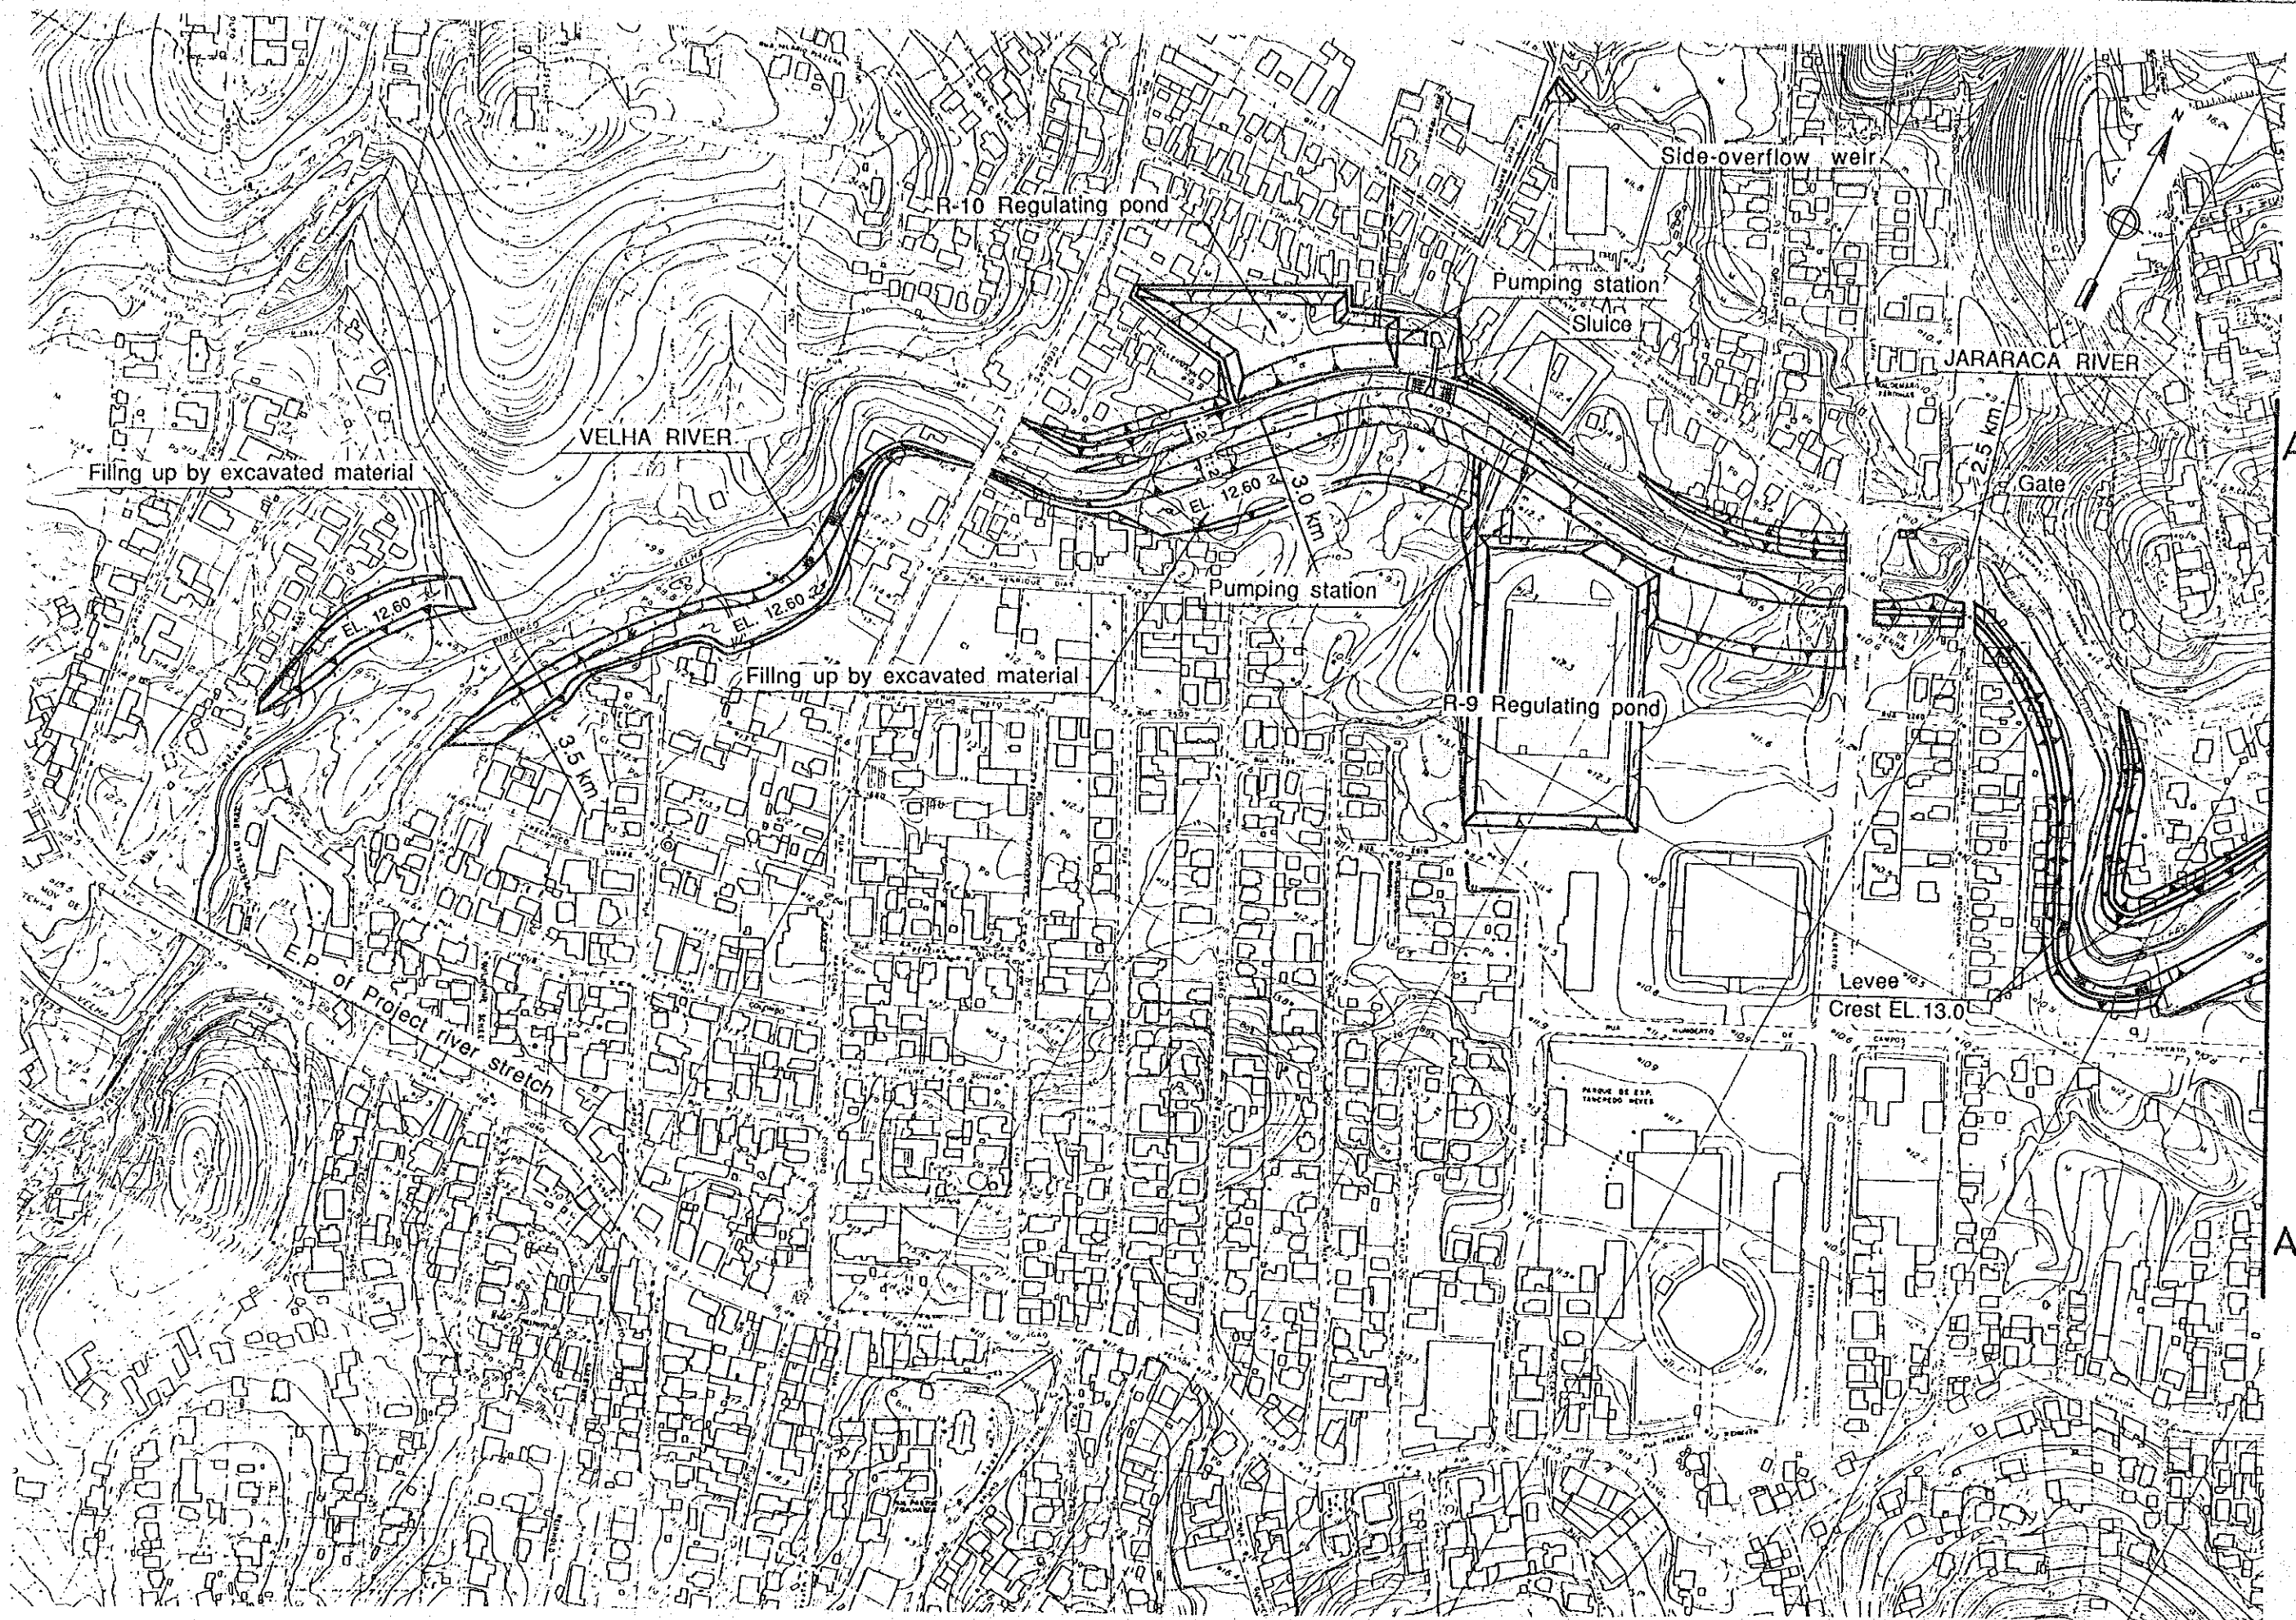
GENERAL PLAN OF RIVER IMPROVEMENT WORK IN VELHA RIVER (2/2)
